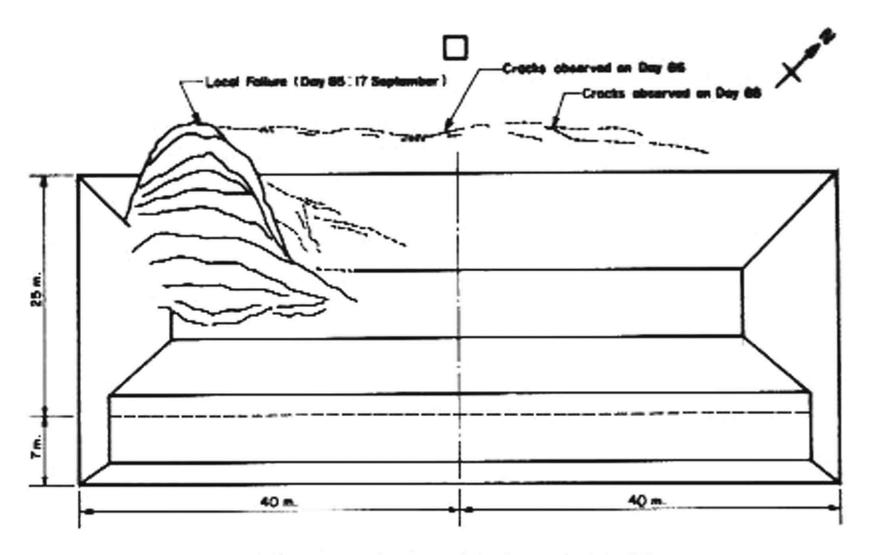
Full scaled test excavation at Nong Ngoo Hao
